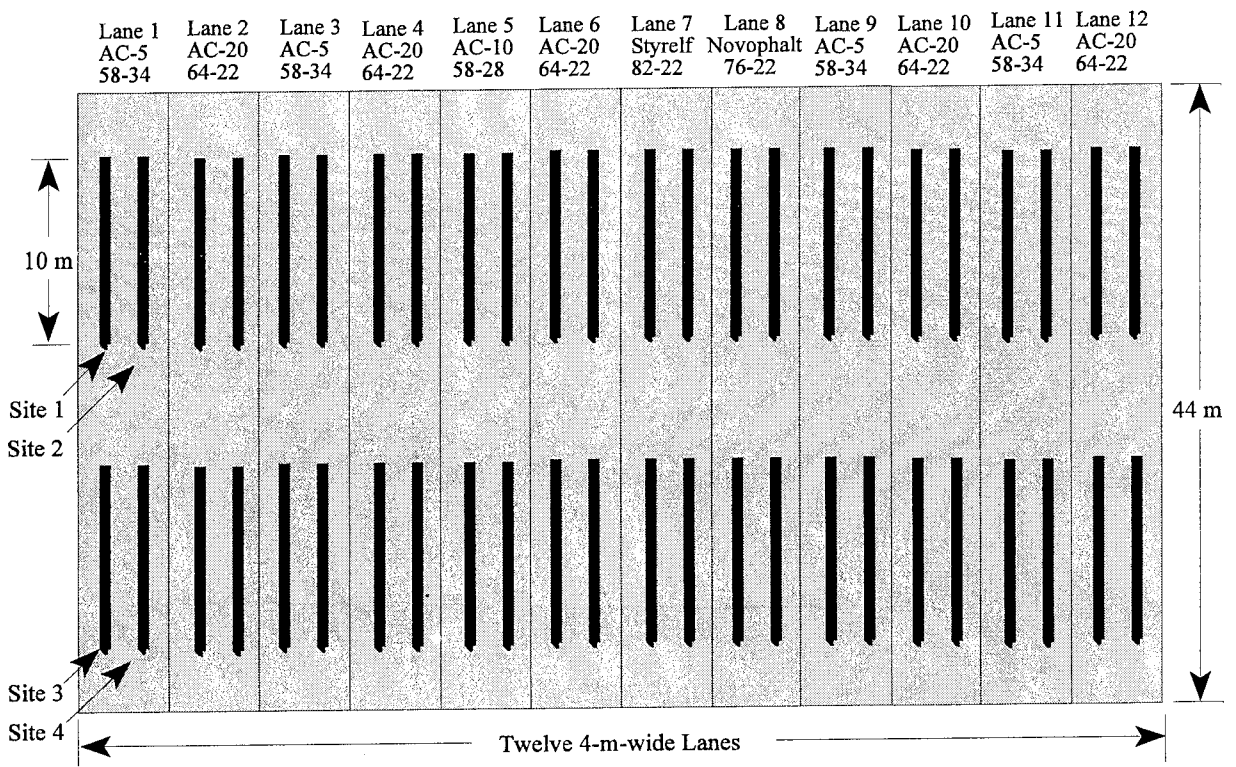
Layout of the test lanes at the FHWA Pavement Testing Facility.
